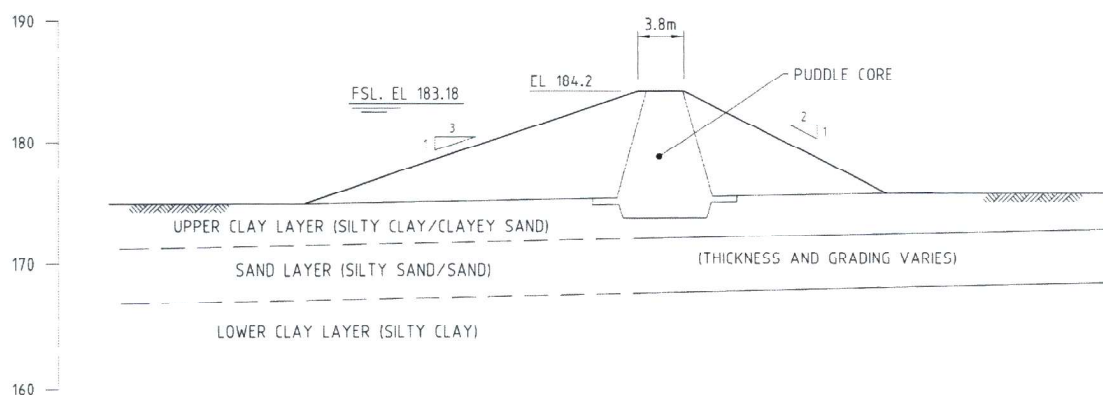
Yan Yean Dam as Constructed, Showing Principal Foundation Sequence
